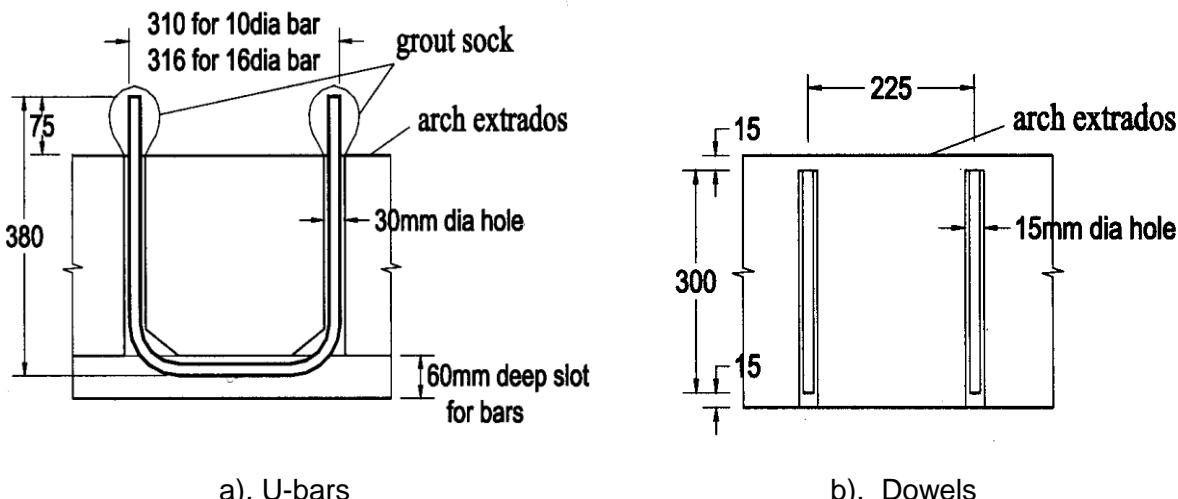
Stainless steel shear reinforcement (all dimensions are in millimetres)
